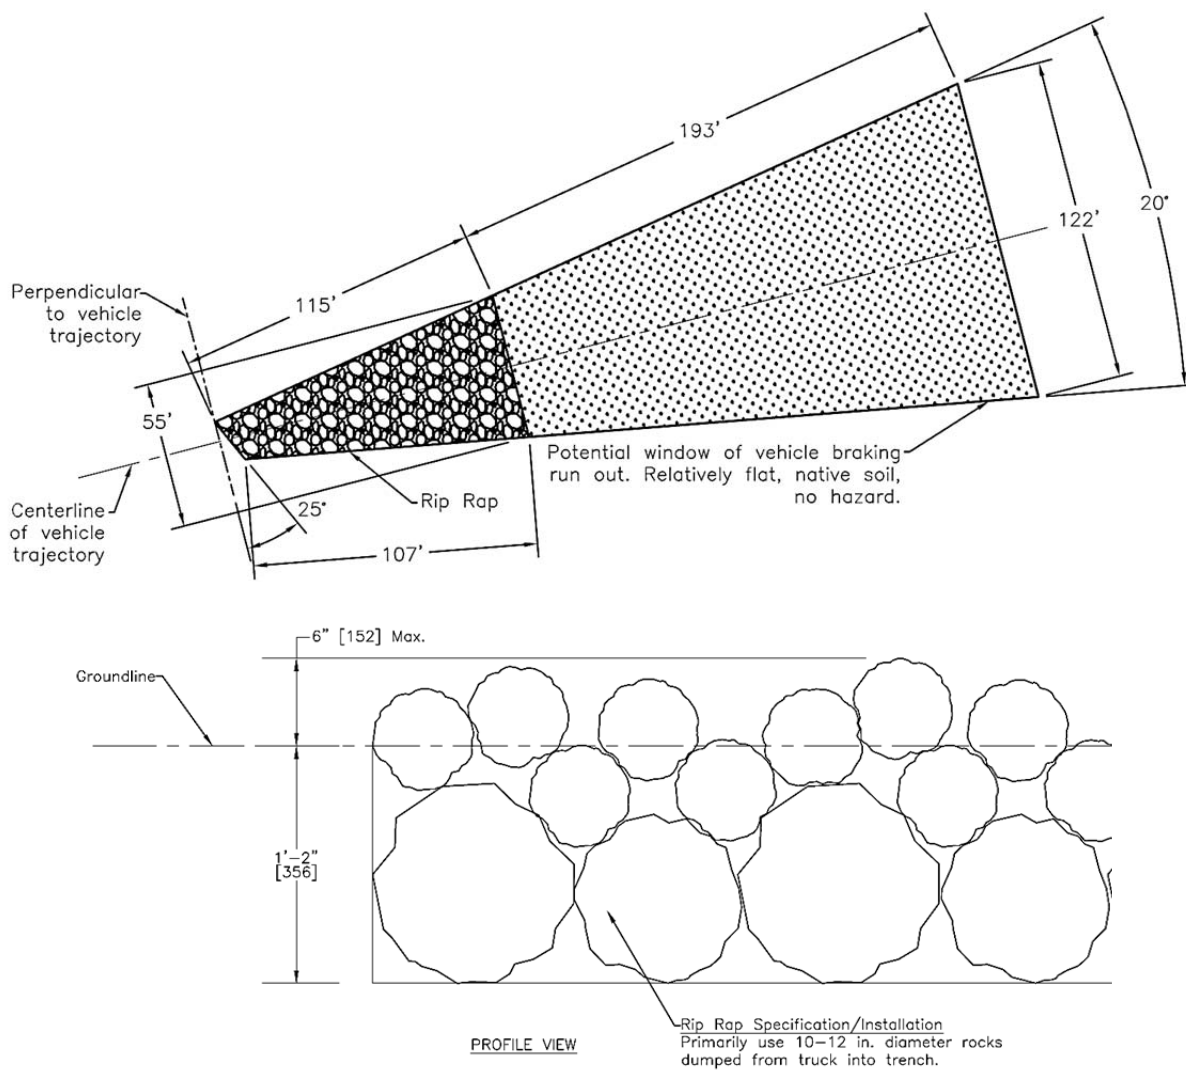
Test No. RDL-1 Installation and Rip Rap Detail
